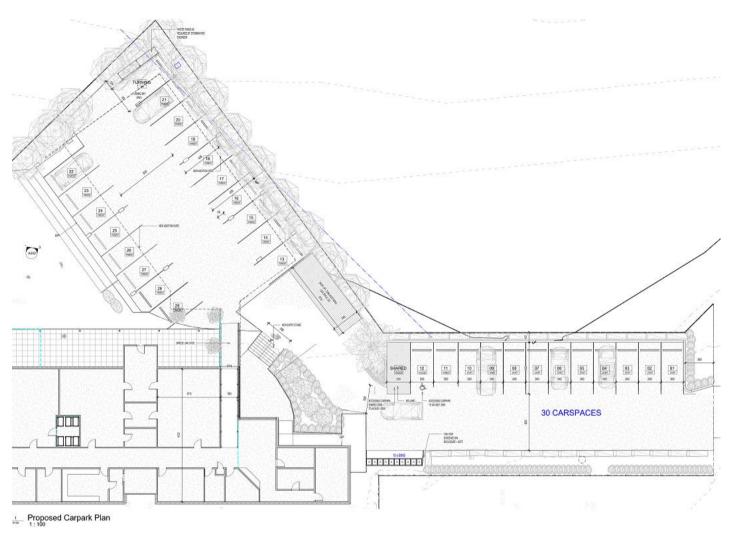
Proposed parking arrangement, with 30 total parking spaces.
